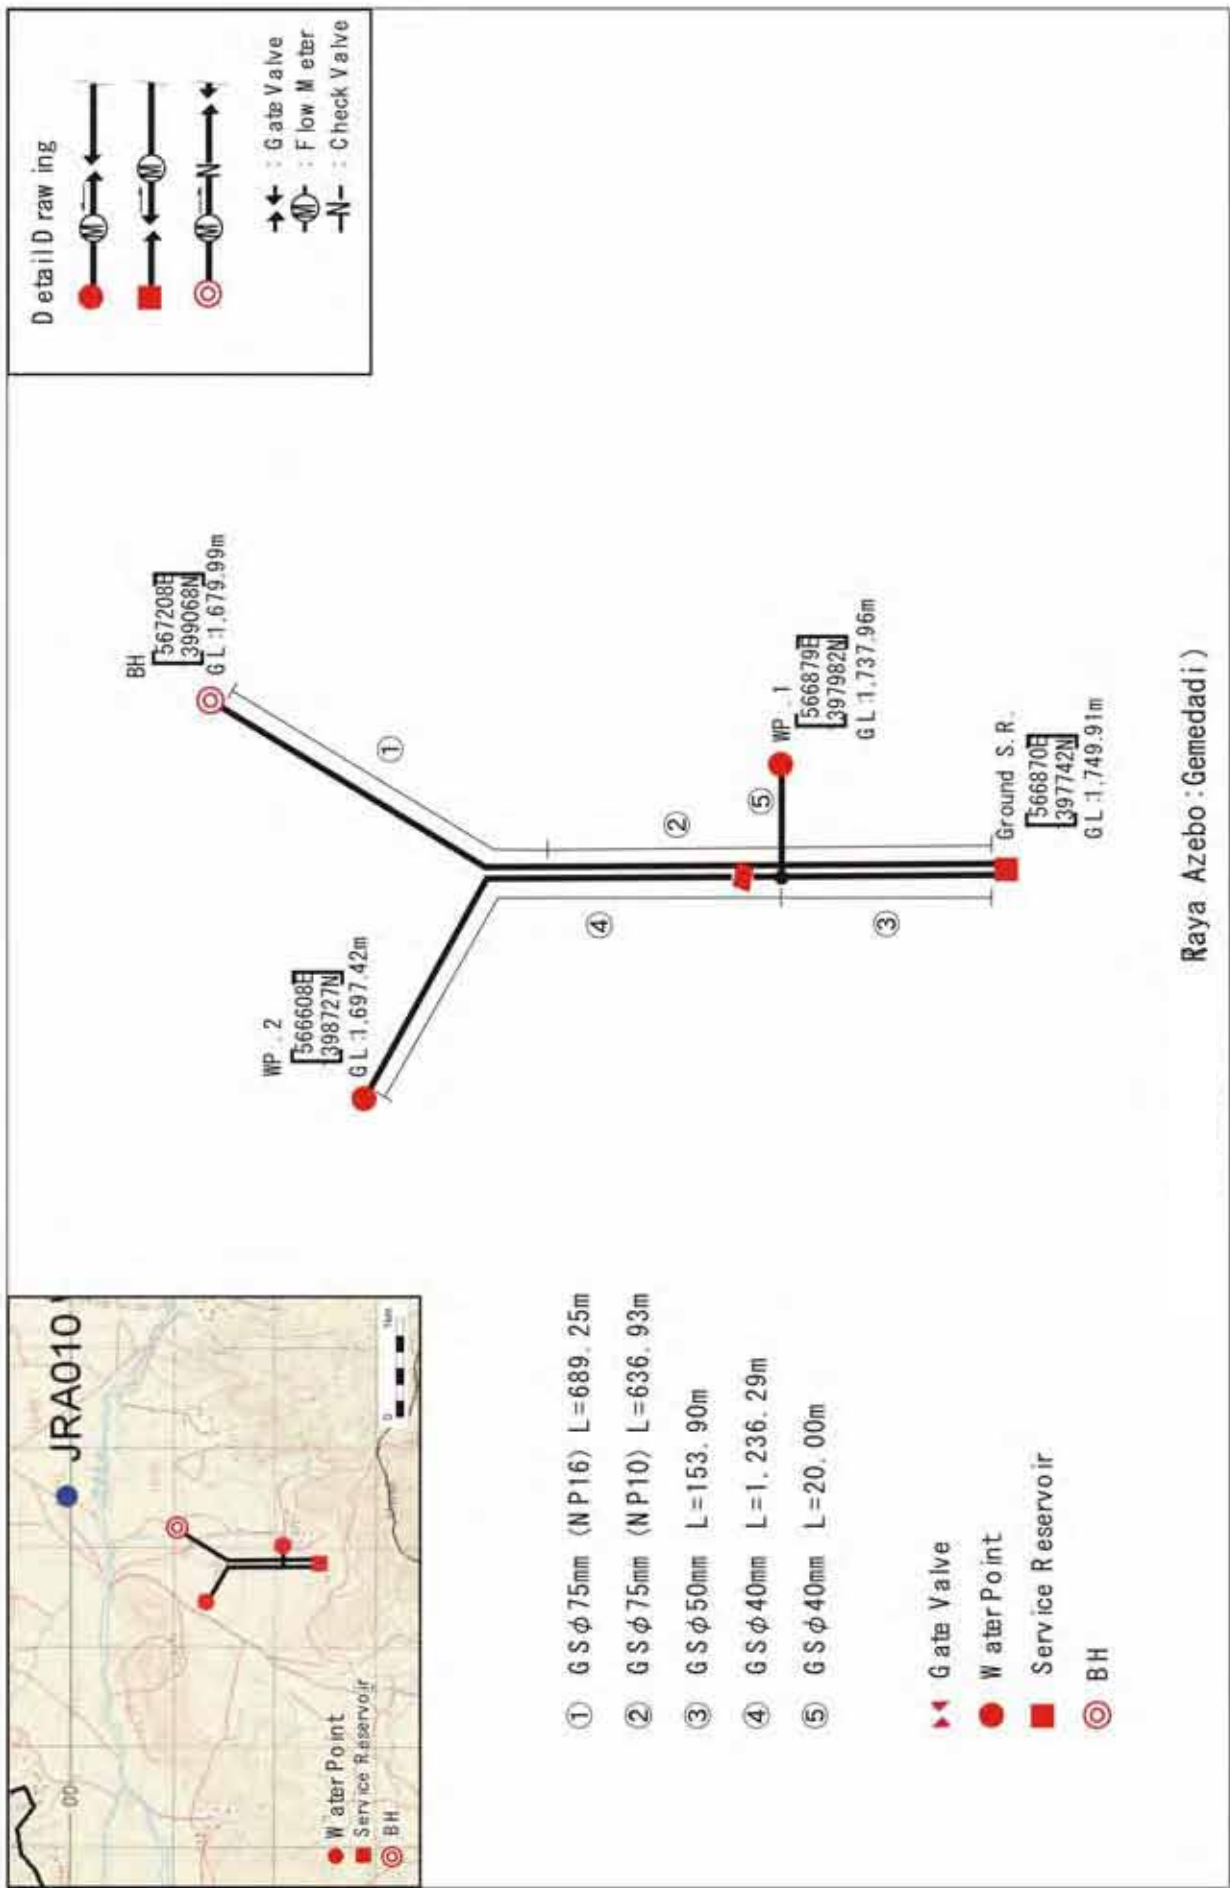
Layout for Water Supply Facility at Gemedadi
